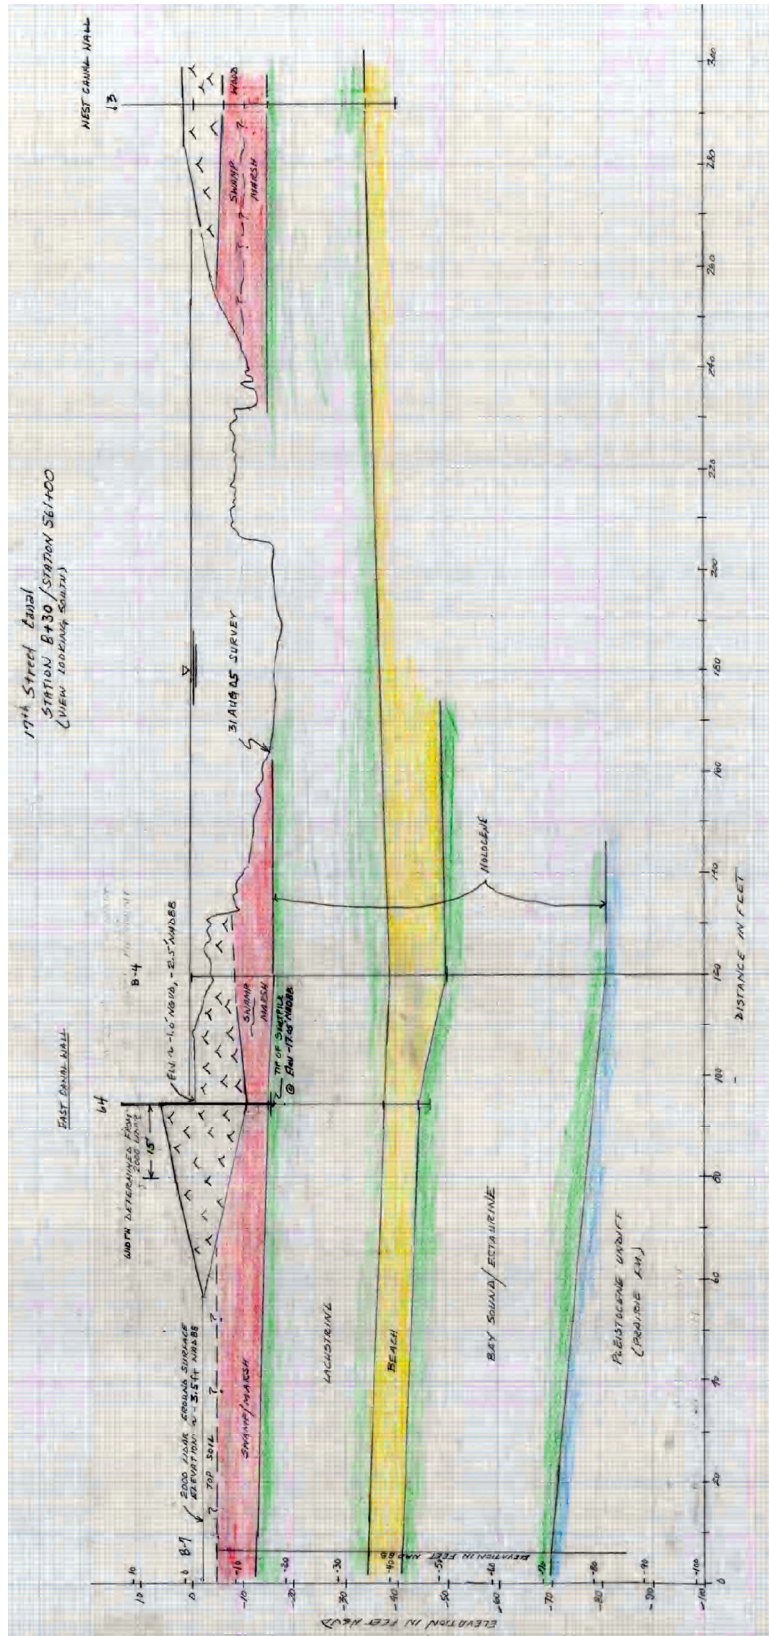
Prefailure Cross-Section at Sta 8+30 (New Stationing)/ Sta. 561+00 (GDM Stationing)
